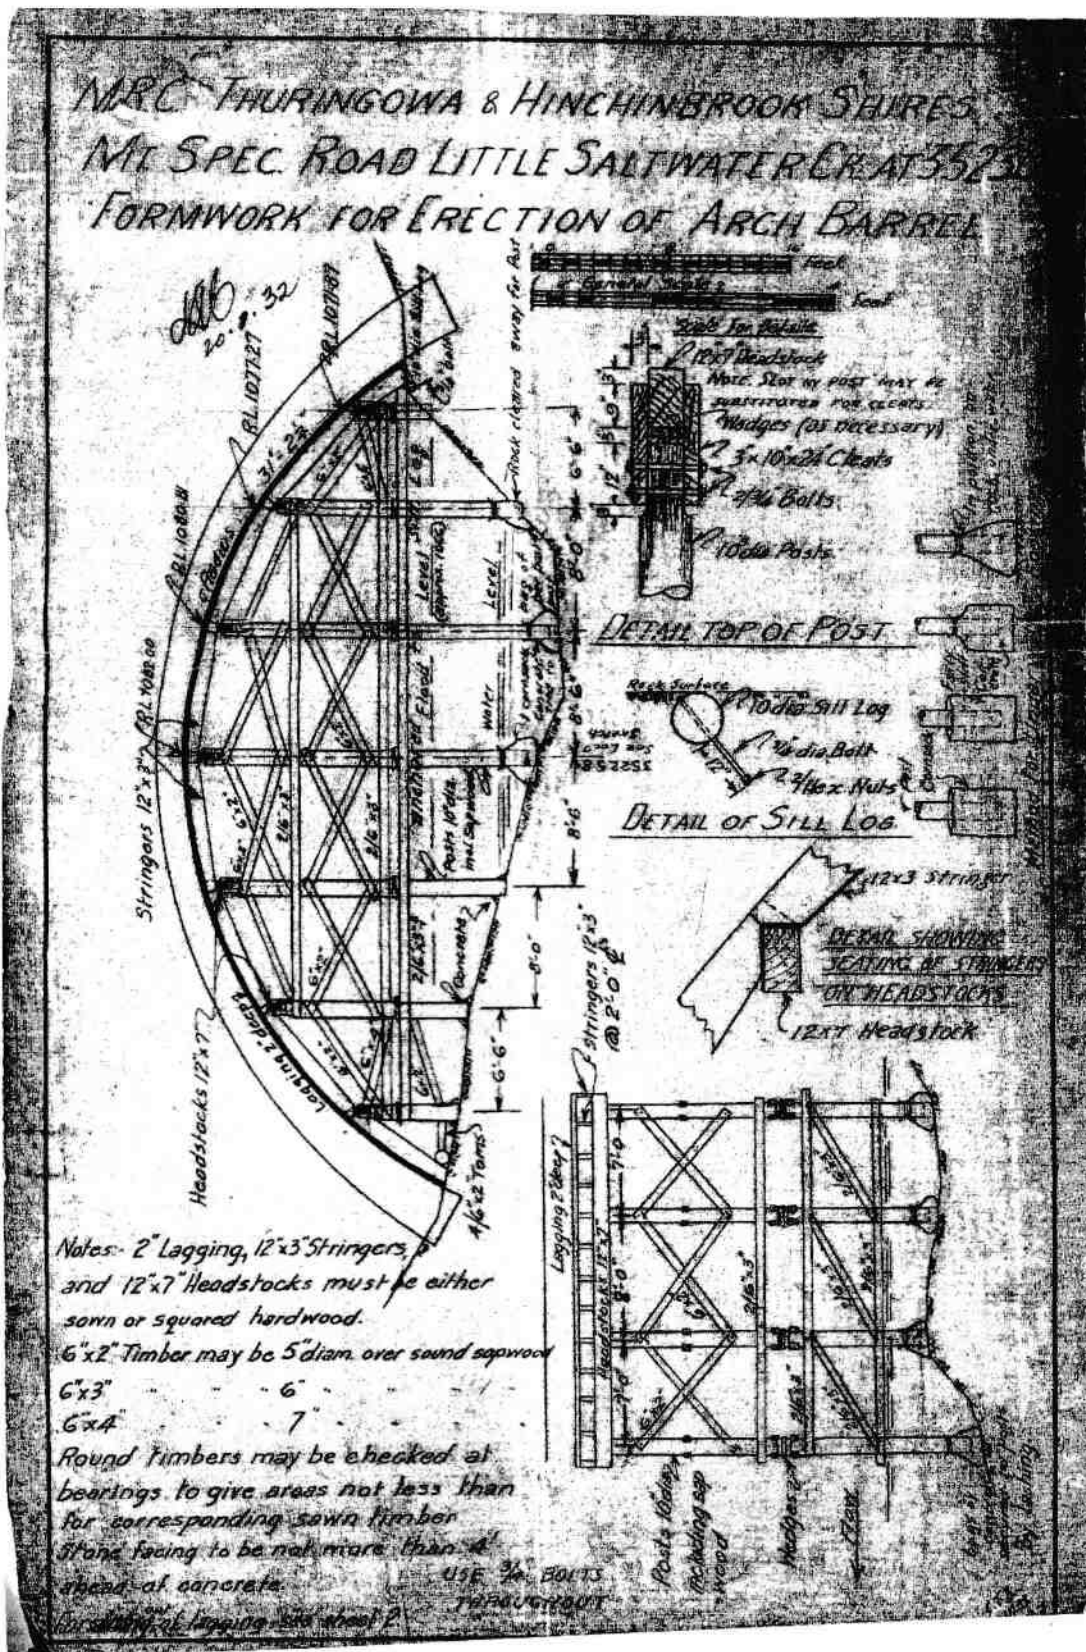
Formwork design for the arch barrel of the Little Crystal Creek Bridge. Source: Qld State Archives Item ID 822274
